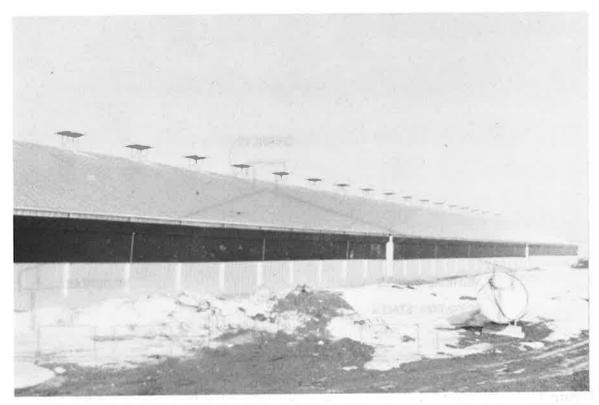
Naturally ventilated breeding-gestation unit with insulated vertical sidewall panels complete with windbreaks and intermittent chimneys.
